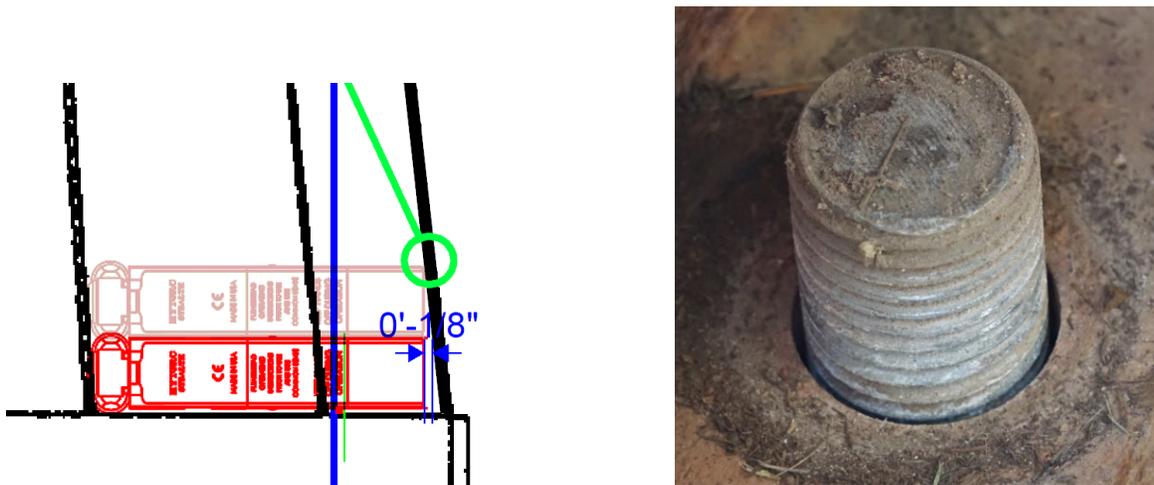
Wrench clearance issues (left) and anchor rod condition (right)
